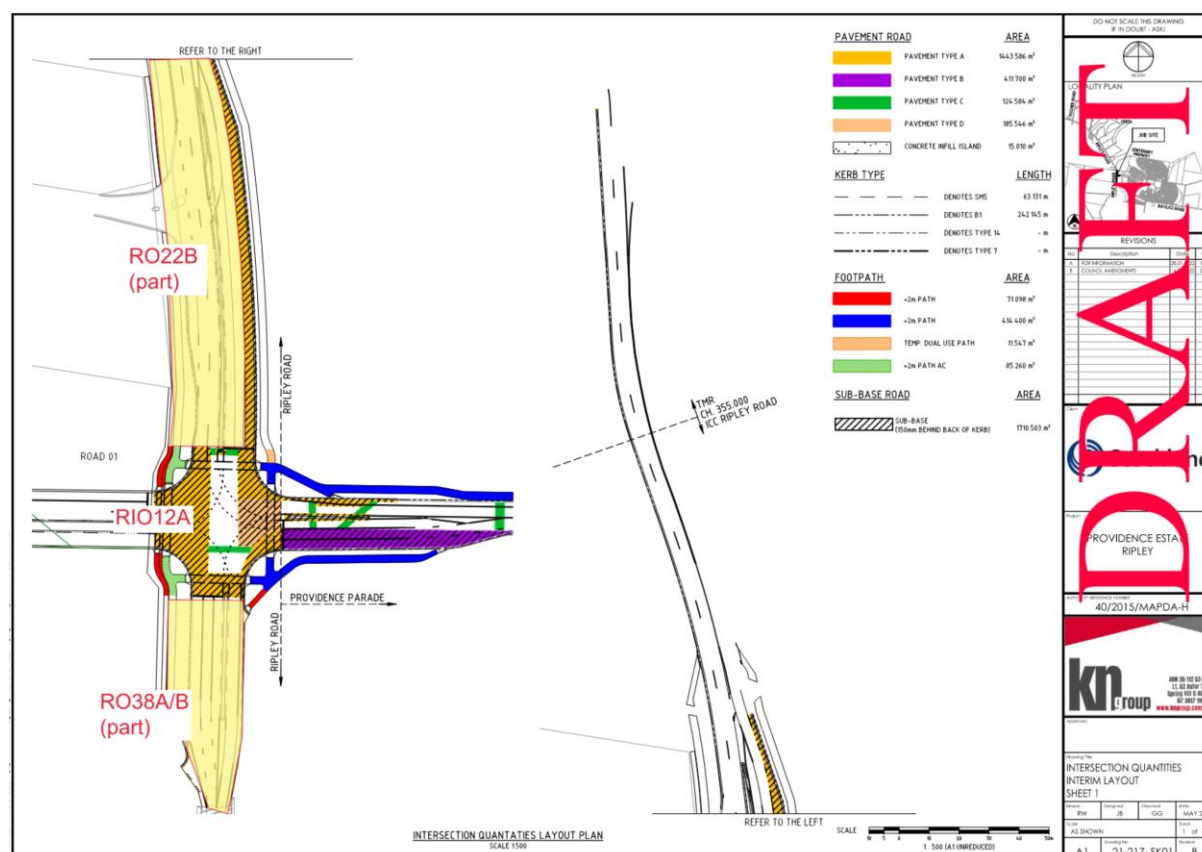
RPEQ Certified Layout Plan for the Upgrade of Ripley Road/Providence Parade Intersection
